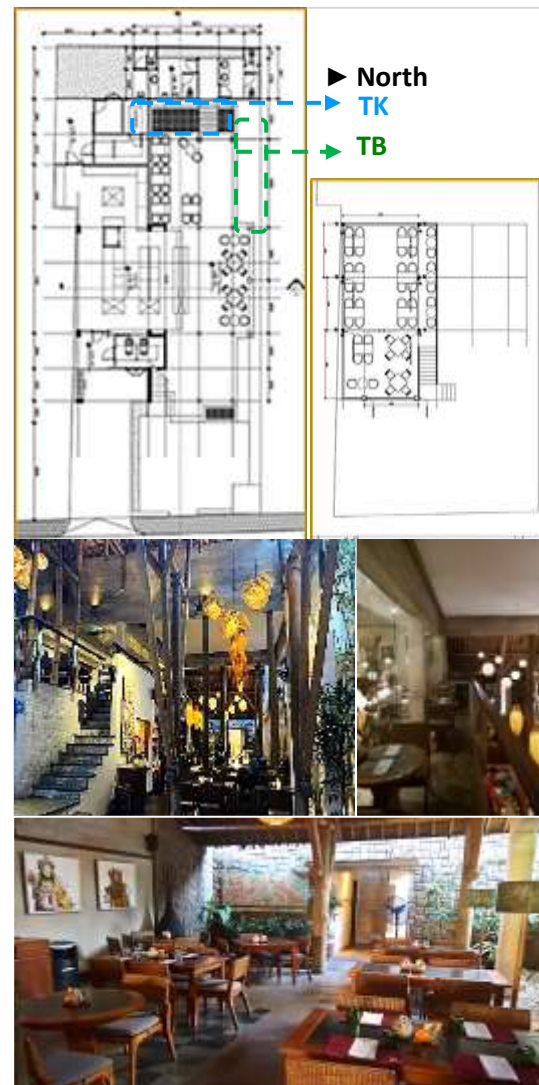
Three Monkeys Restaurant spatial layout. Top-left: Ground floor plan image, M= Merajan, G=garage, D=Kitchen, TB=Bamboo Garden, TK=Pool Garden. Above-right: Upper floor plan (covered dining room, front-facing terrace). Centre-left: Lower terrace, interior-facing room, stairs to mezzanine. Center-right: Mezzanine edge terrace. Below: Open interior space on the right side (garden) and back (pool)
